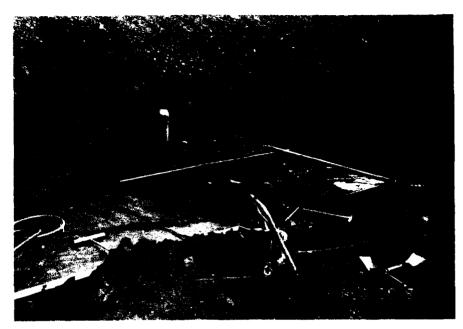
Spillway wall footing R-15. Note wheel mounted piece of equipment in lower portion of Photo with angle of form boards immediately behind. Form board angle and foundation fracture trend are those of previous Photos. Fractures in the darker shale to the right (upstream) in the upstream portion of R-15 dip downstream (to the left).
